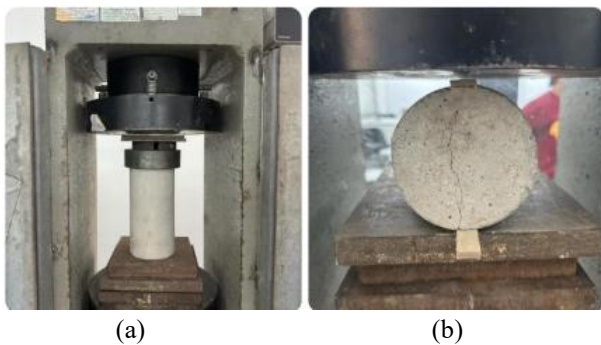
(a) Compressive Strength Test of Concrete and (b) Split-Tensile Strength Test of Concrete
